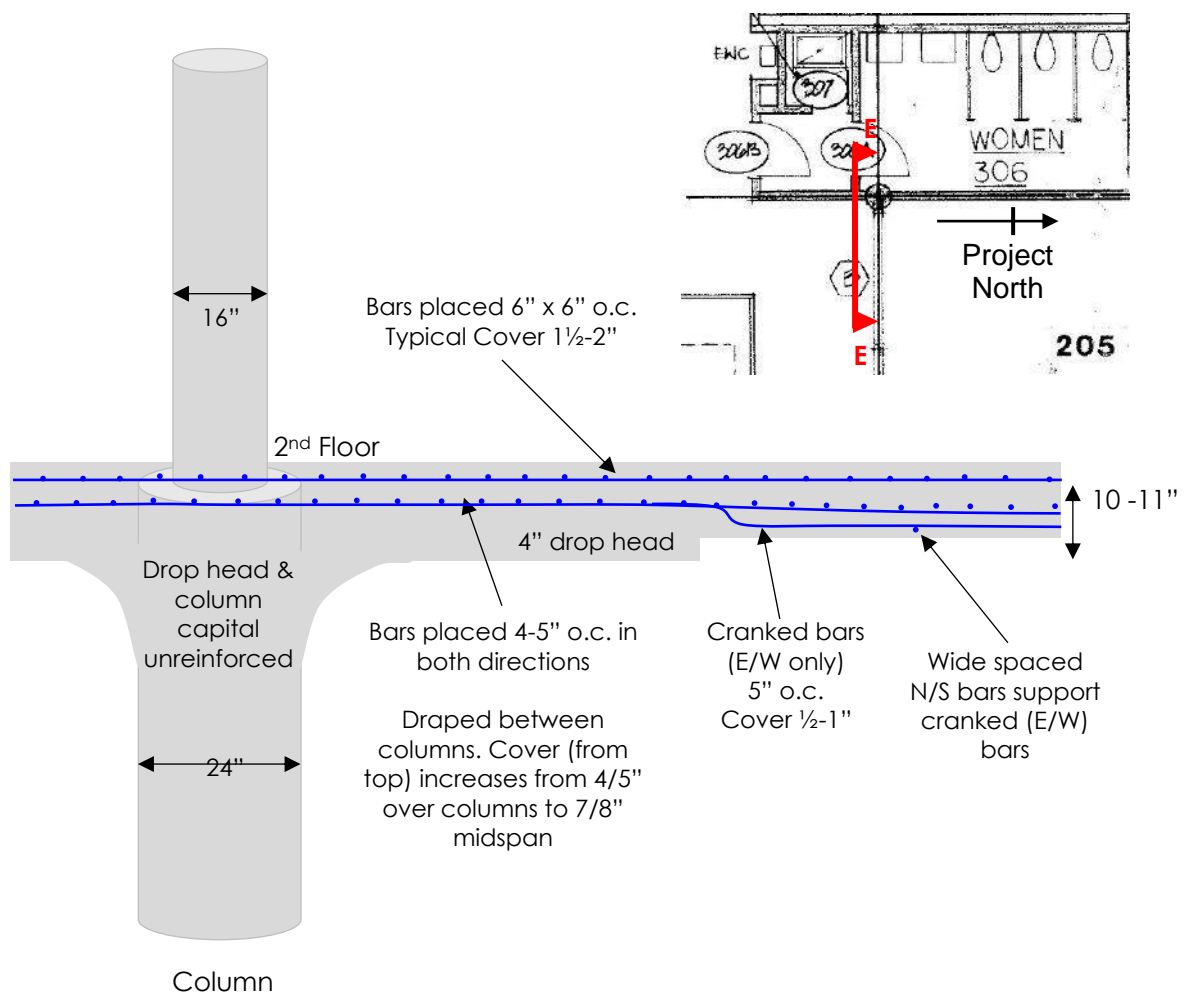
Schematic Section E-E showing 2nd floor construction arrangement (using GPR data from Areas 3 & 9)
